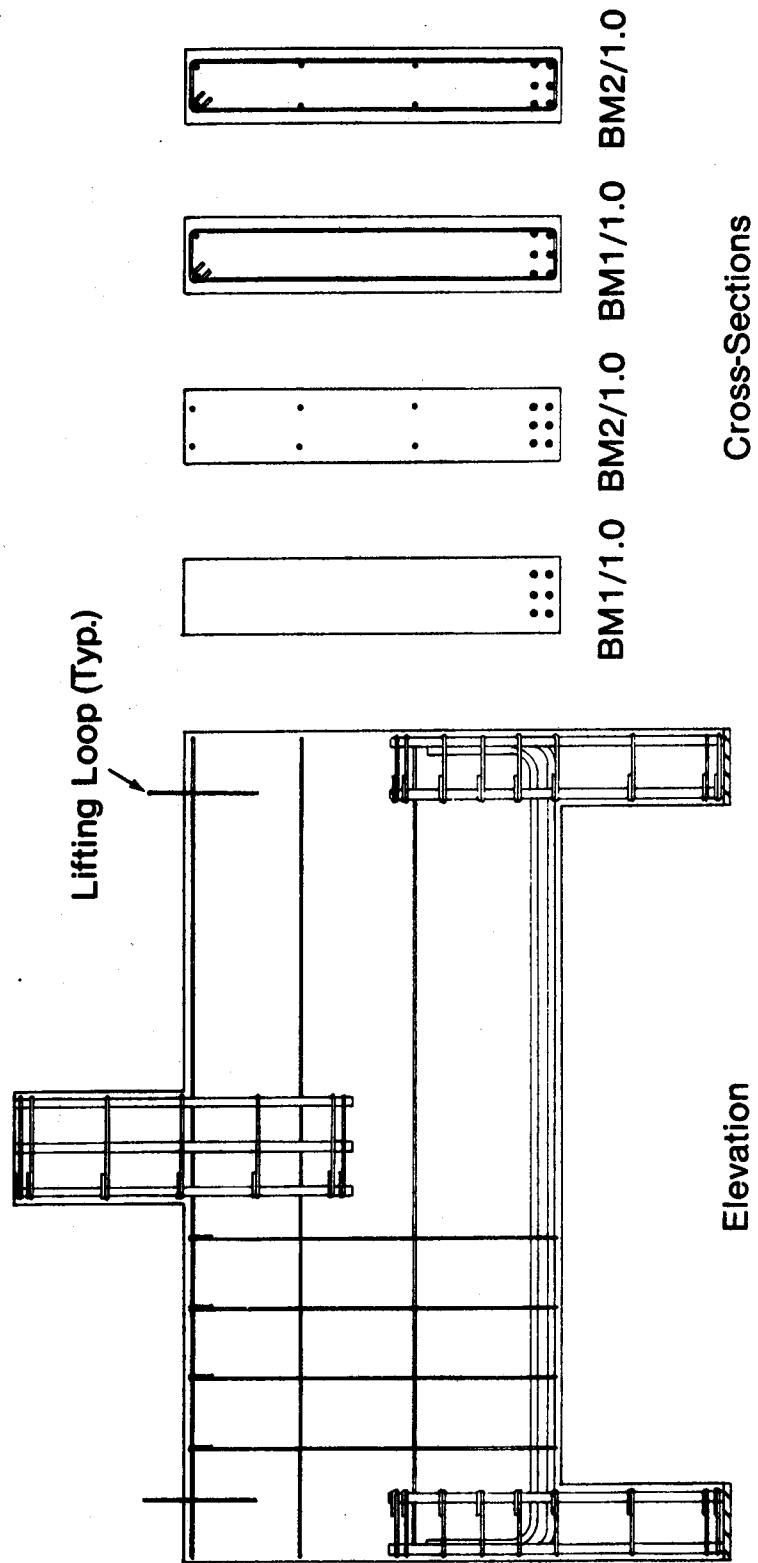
Beam 1/1.0 and 2/1.0 Reinforcement Details.
